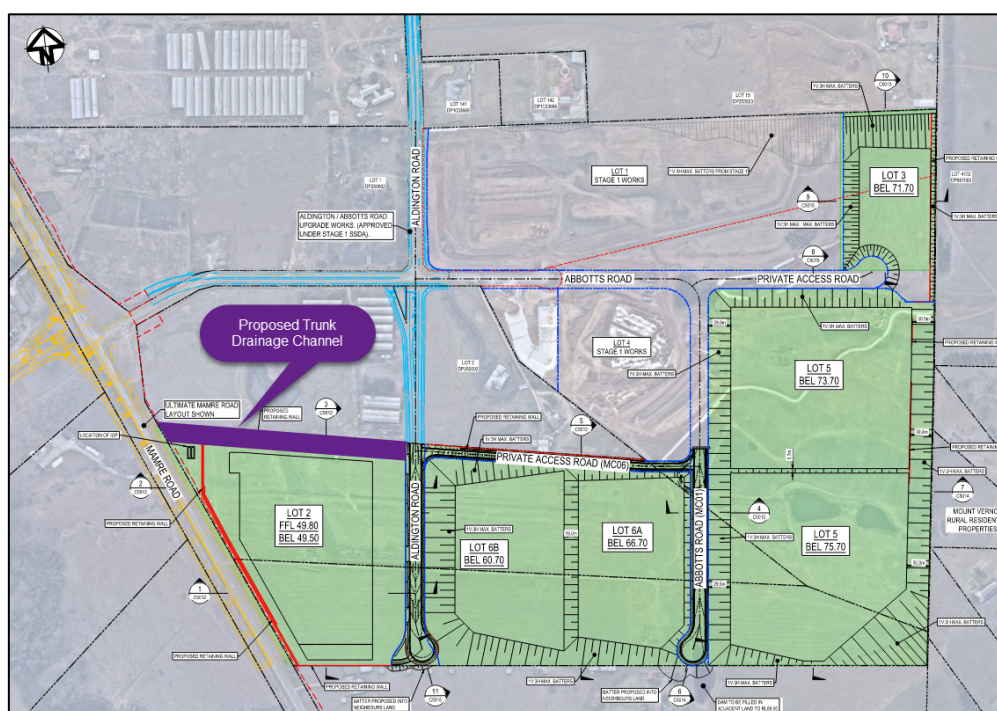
Westlink Stage 2 Proposed Development (Source: AT&L Civil Plans)
